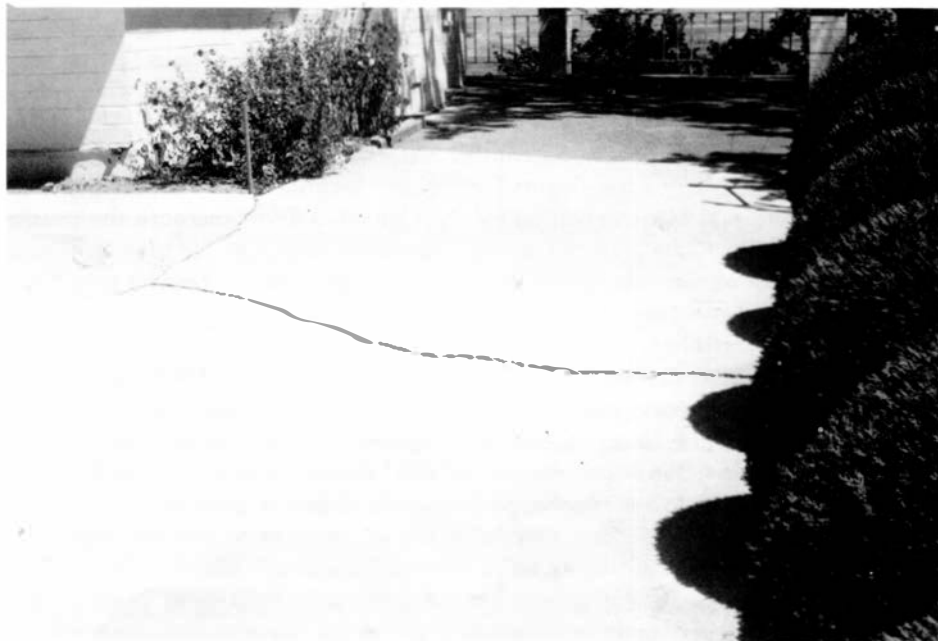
Ongoing slide activity has damaged driveway of house shown in Figure 40.
